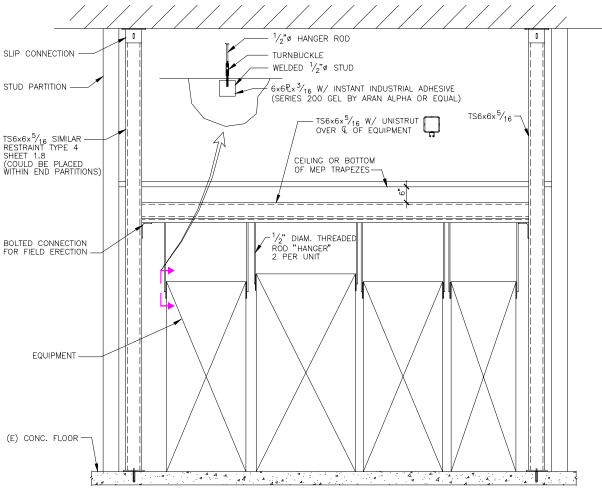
Alternative Equipment Restraint System at Equipment Halls (Requires Engineering Design)
